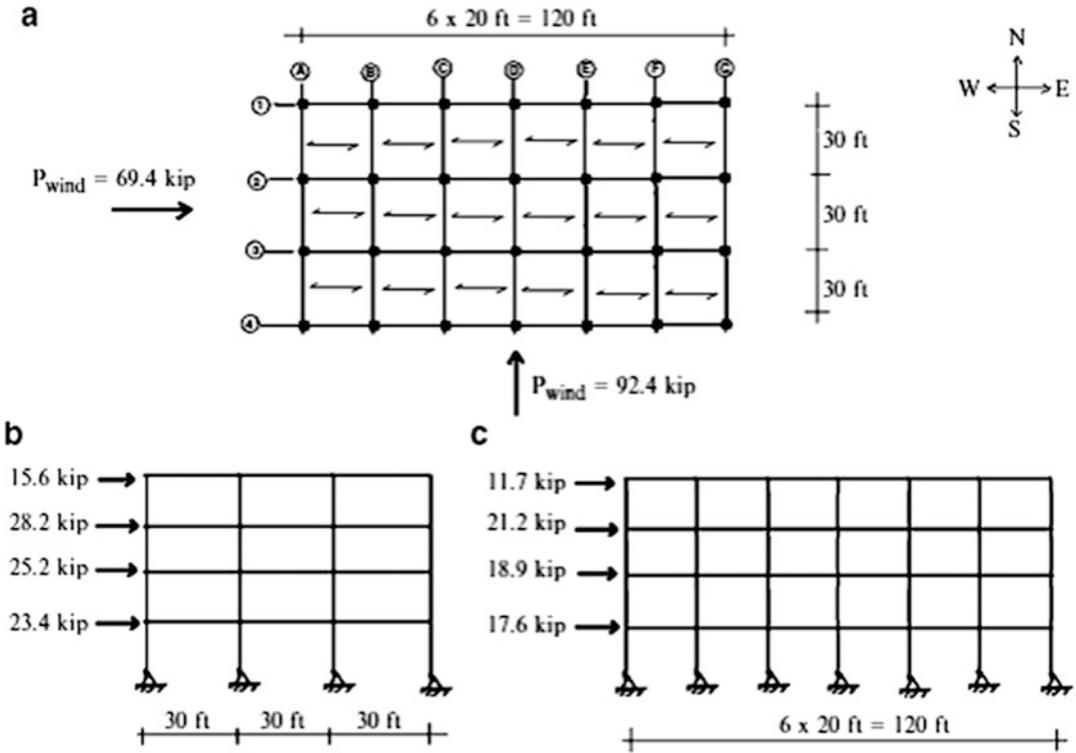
Global Wind loads. (a) Plan. (b) N-S. (c) E-W
